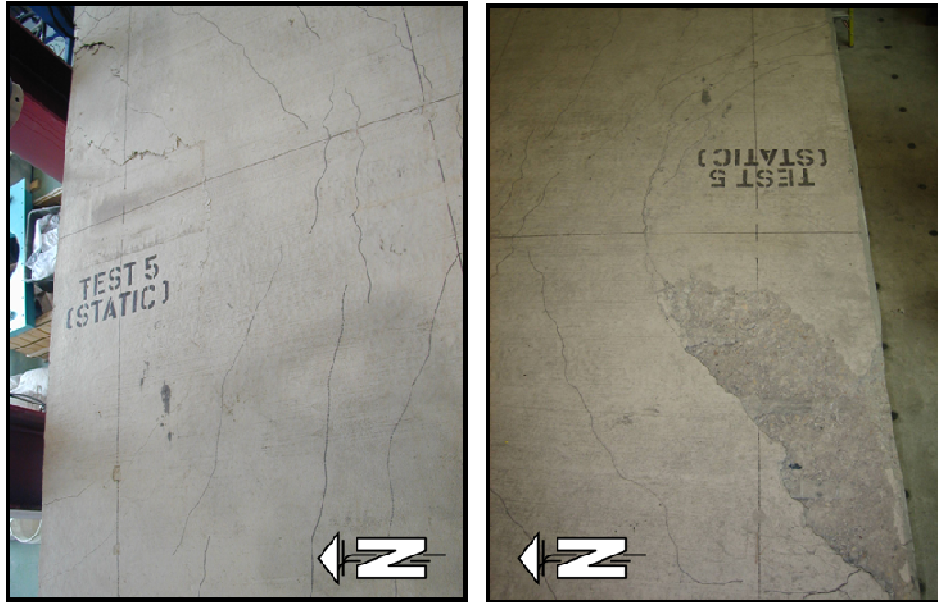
(a): Top view of semi-circular punching type failure for the cantilever section with top transverse GFRP reinforcement subjected to static monotonic loading (Klowak, 2007)
